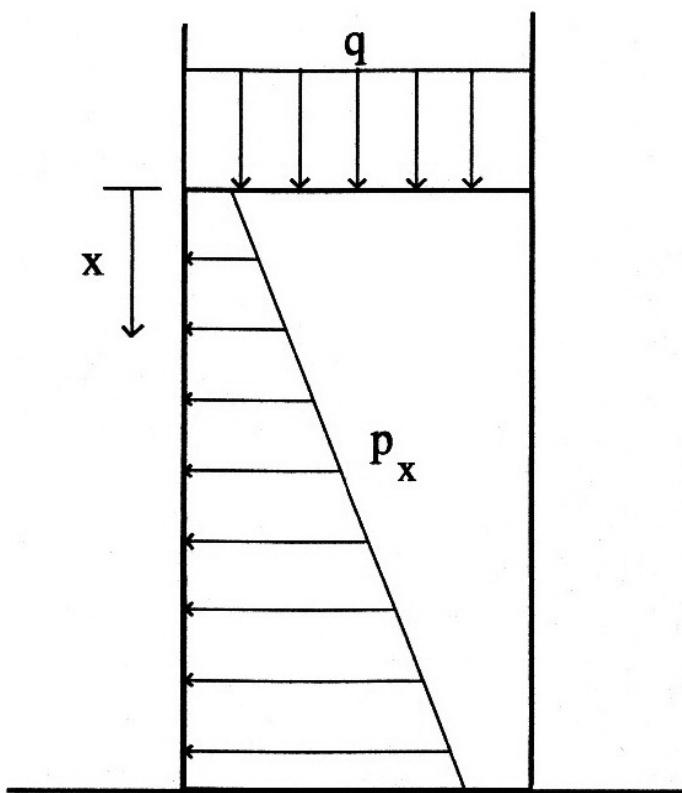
Determination of mould pressure for a wall mould (RIL 2001)
